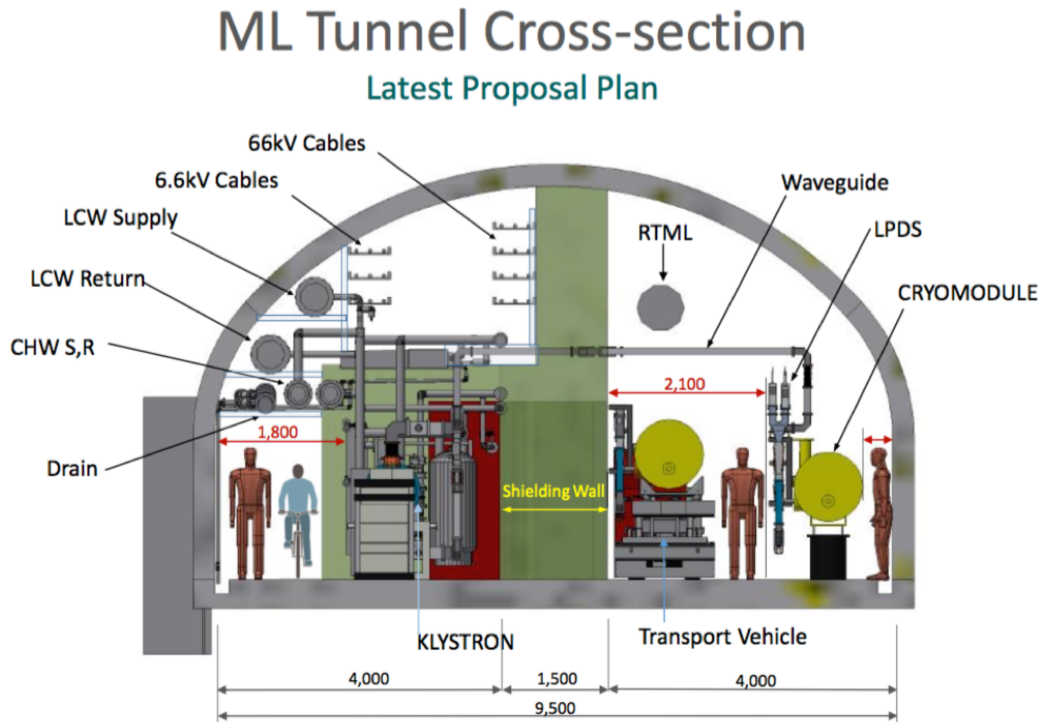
Cross section of “Kamaboko-shaped” tunnel [6]. This tunnel is designed for the DKS option and mountainous topography.
